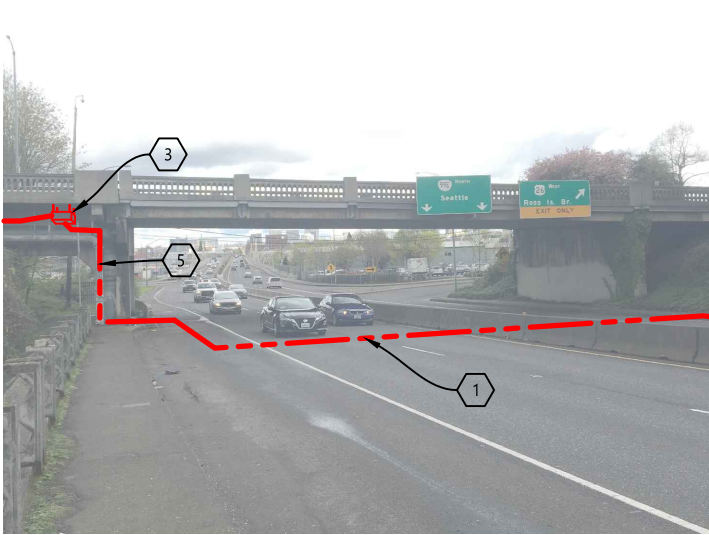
FACING NORTH ON SOUTH SIDE OF BRIDGE, EAST SIDE OF WILLAMETTE RIVER
